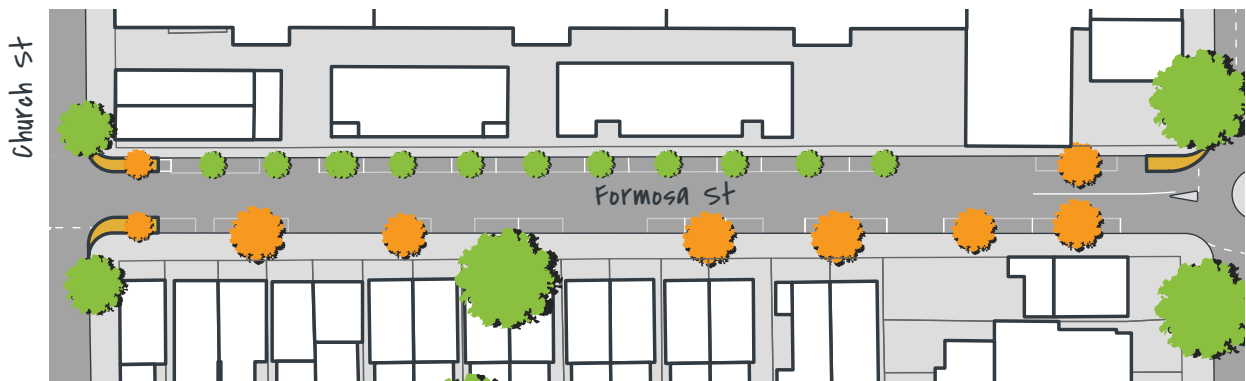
Plan of potential landscape 'blisters' and new street trees along Formosa Street
